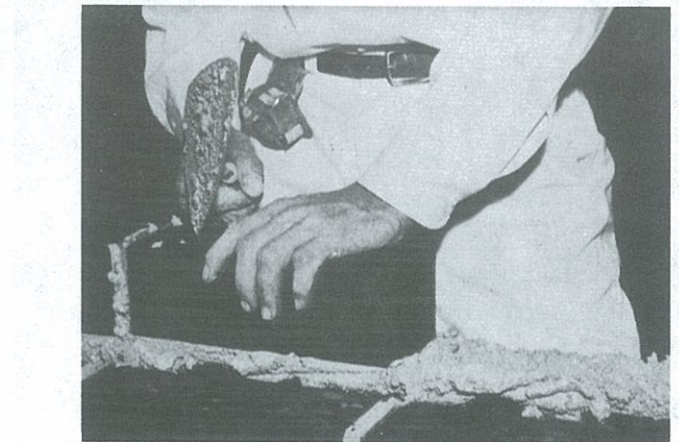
Furrowed bed joint. Too much overhang in grout space. Not recommended.
